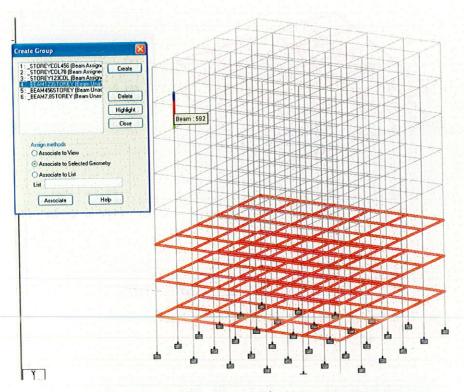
Beams of 1st, 2nd and 3rd storey designed the same
